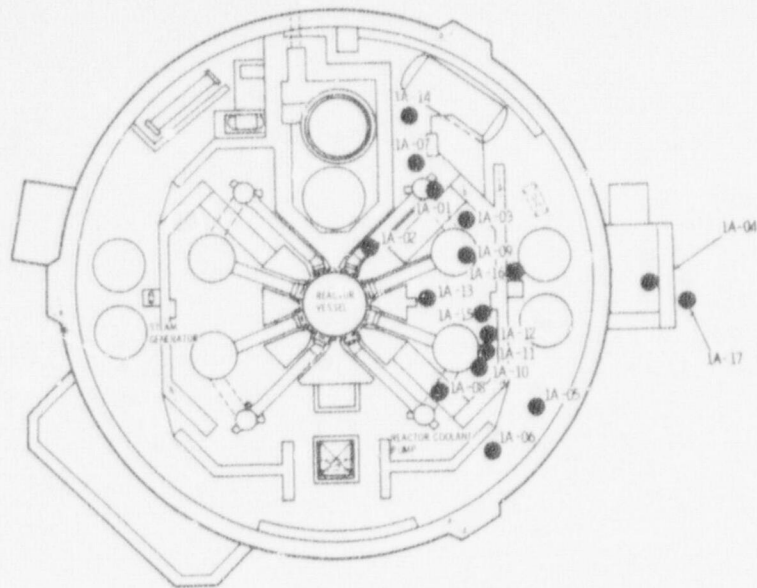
Source Locations in Containment Building At 45-Ft Elevation(10)
